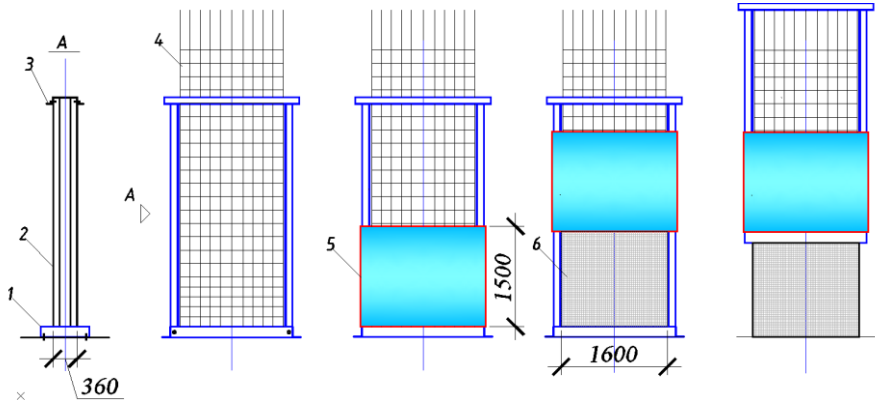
Scheme of concreting a vertical building structure with a module: 1 – support frame; 2 – vertical guides; 3 – upper beam; 4 – reinforcement frame; 5 – formwork module; 6 – building structure
